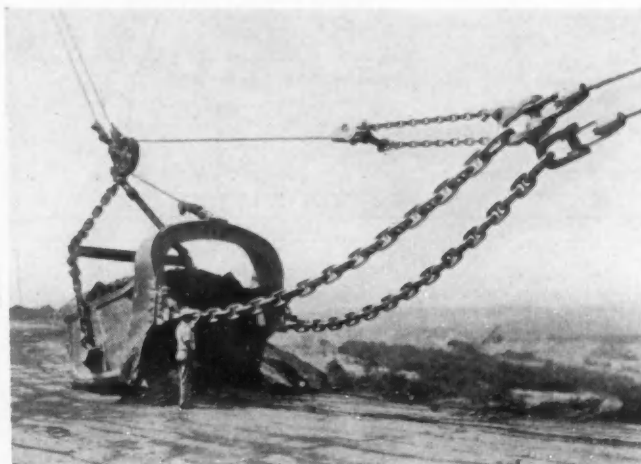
Loading frequency tests have been performed on a large dragline such as this one, which is used in strip mining. Bucket for this machine is shown at right
